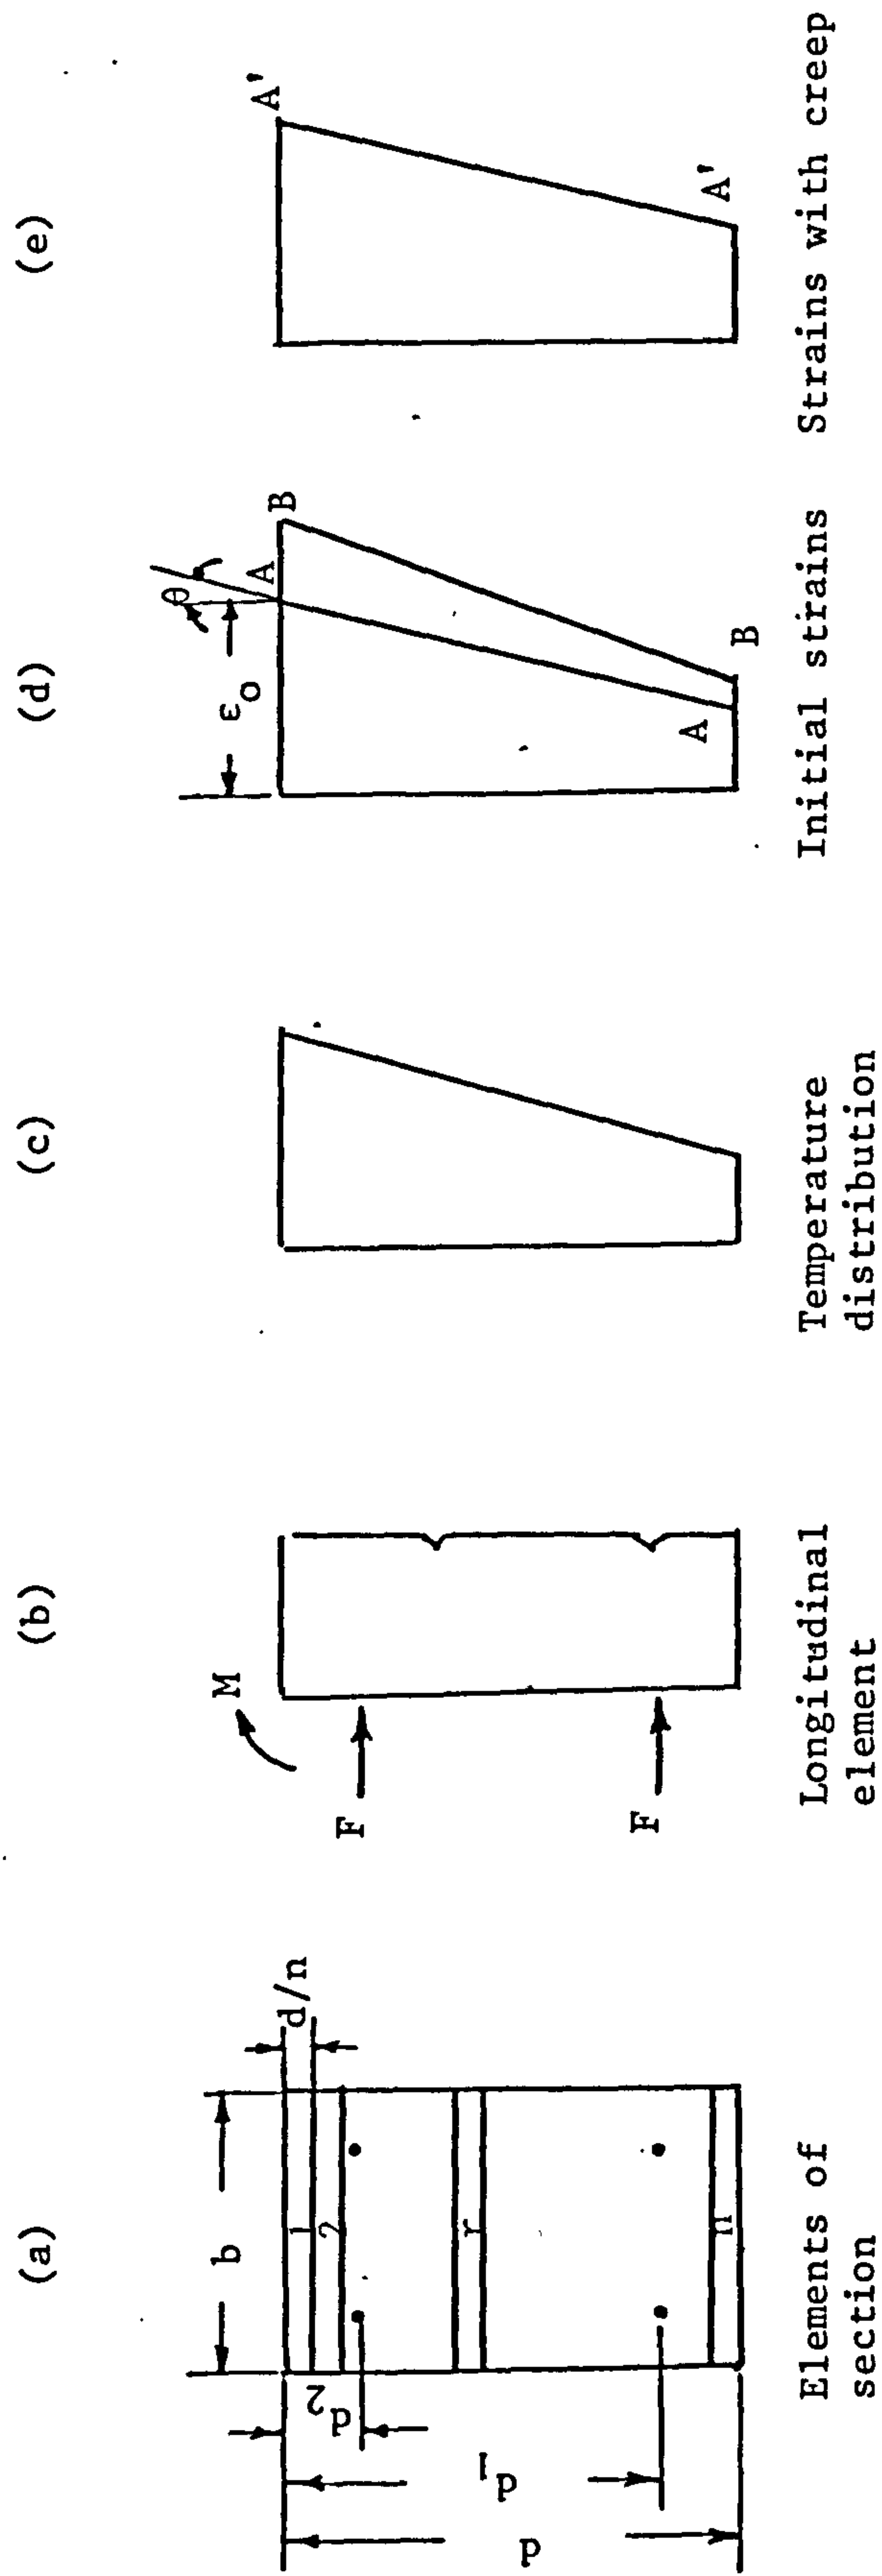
Strains in prestressed concrete beam subject to temperature crossfall
